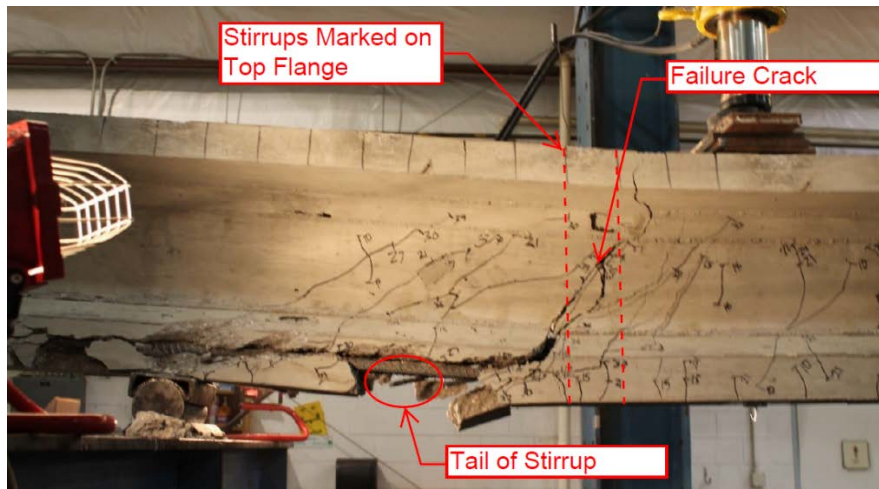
Failure of Specimen with 3 Typical CFCC Reinforcement
